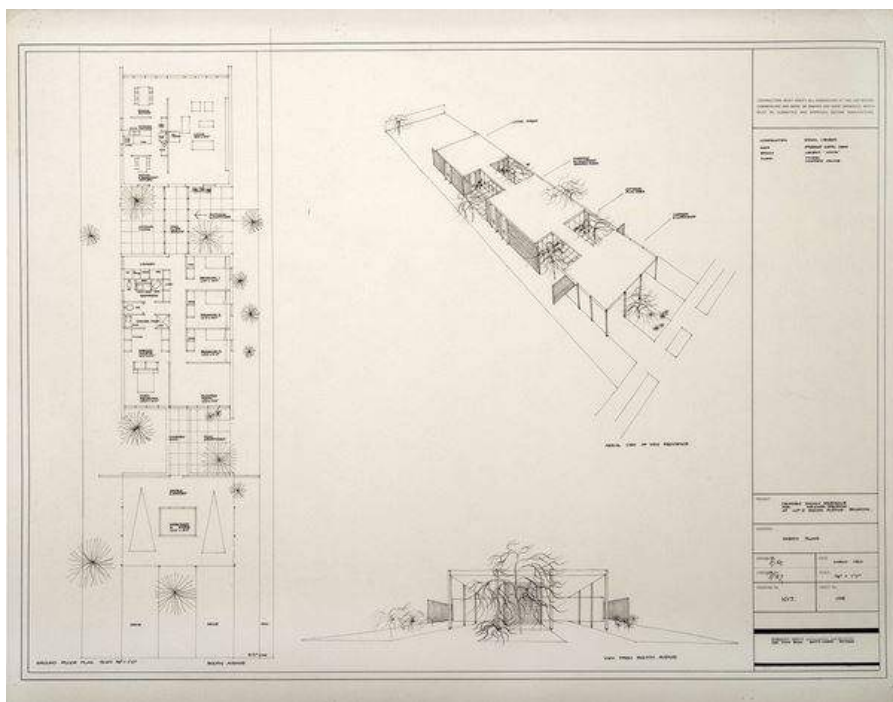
Working drawings of proposed residence for Mr & Mrs Spedding at 27 Bolton Avenue Brighton, 1963 (Source: RMIT Design Archives)
